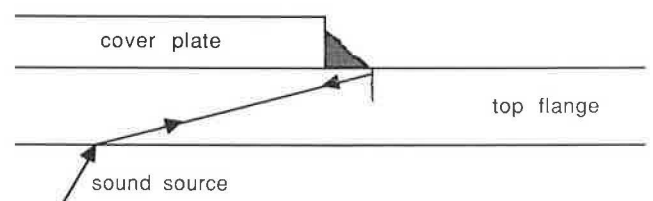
Sound reflection from fatigue crack at weld toe.
